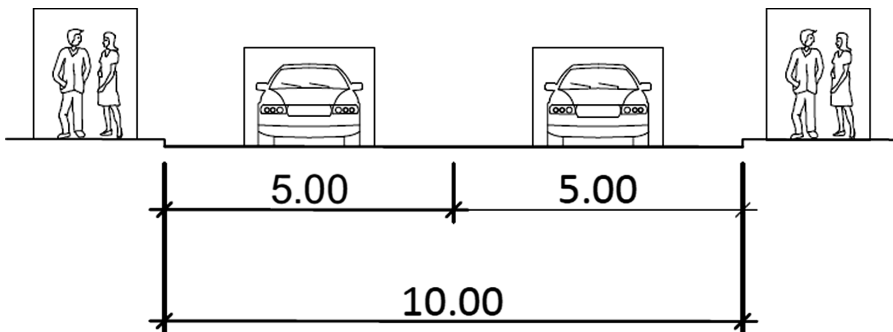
Current status – road cross-section of P.O. Hviezdoslava Street and Jilemnického Street.
